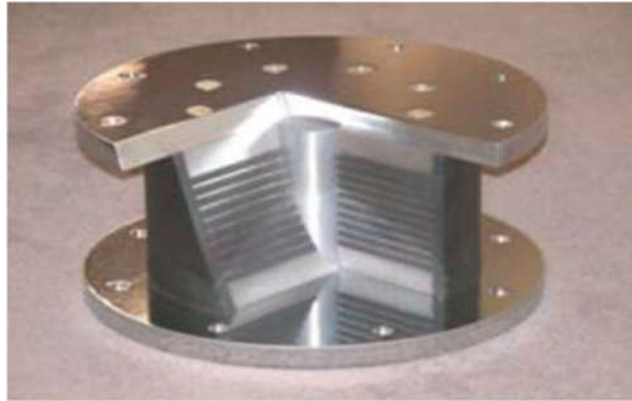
Sectional view of lead-rubber bearing. (Constantinou et al. 2007b)
